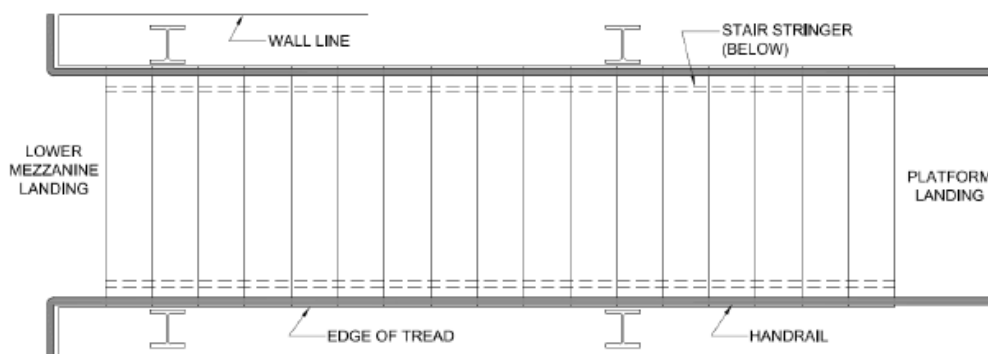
Existing plan view of Stair P2 (Stair P3 similar)
